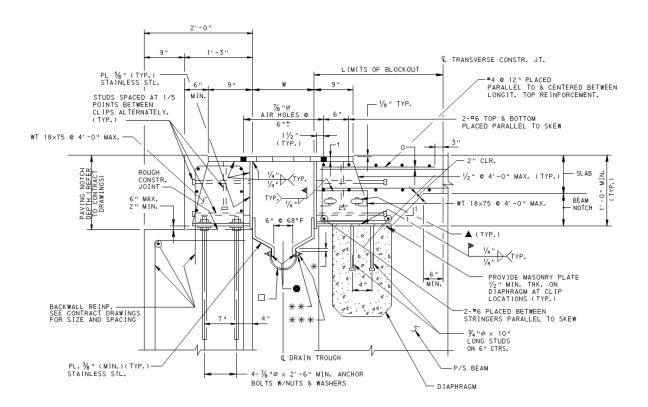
PennDOT tooth expansion dam detail (prestressed concrete beam bridge)
